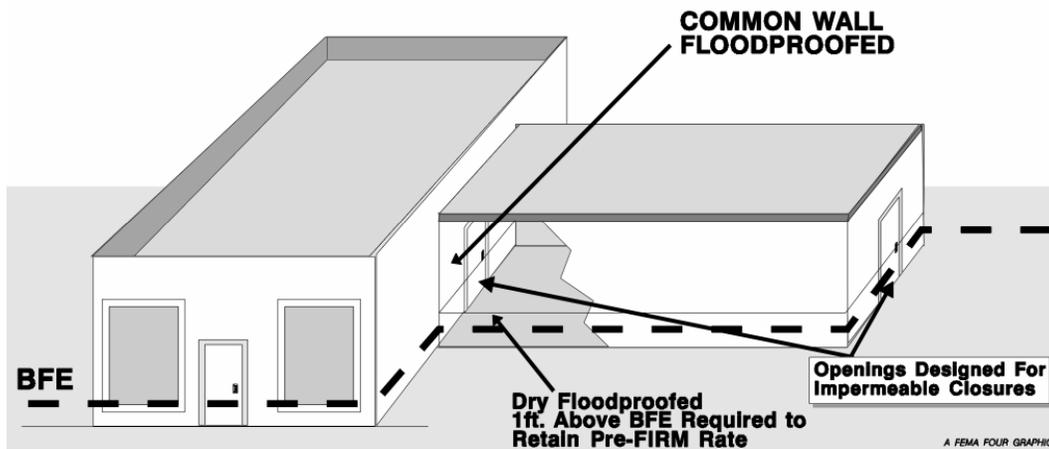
Lateral addition to a nonresidential building in an A Zone.
